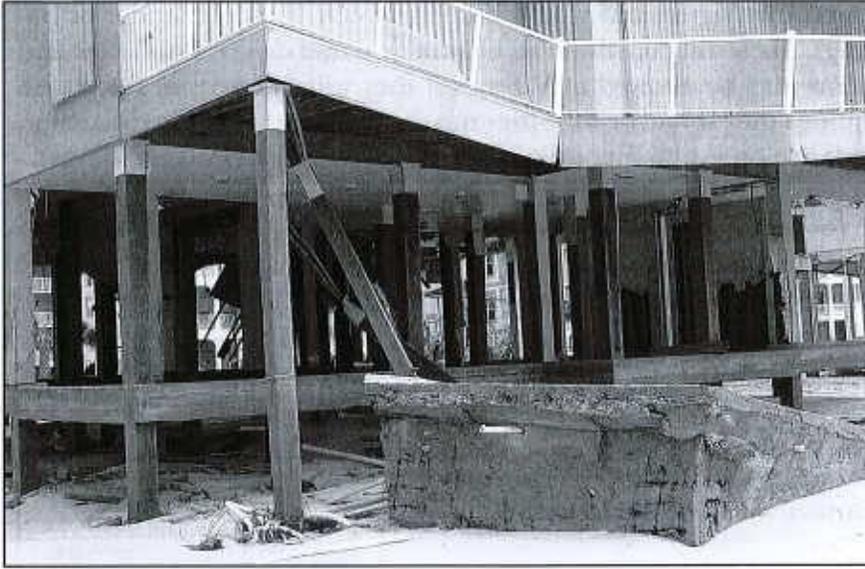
Movement of a spa likely caused failure of two piles supporting an elevated deck.
